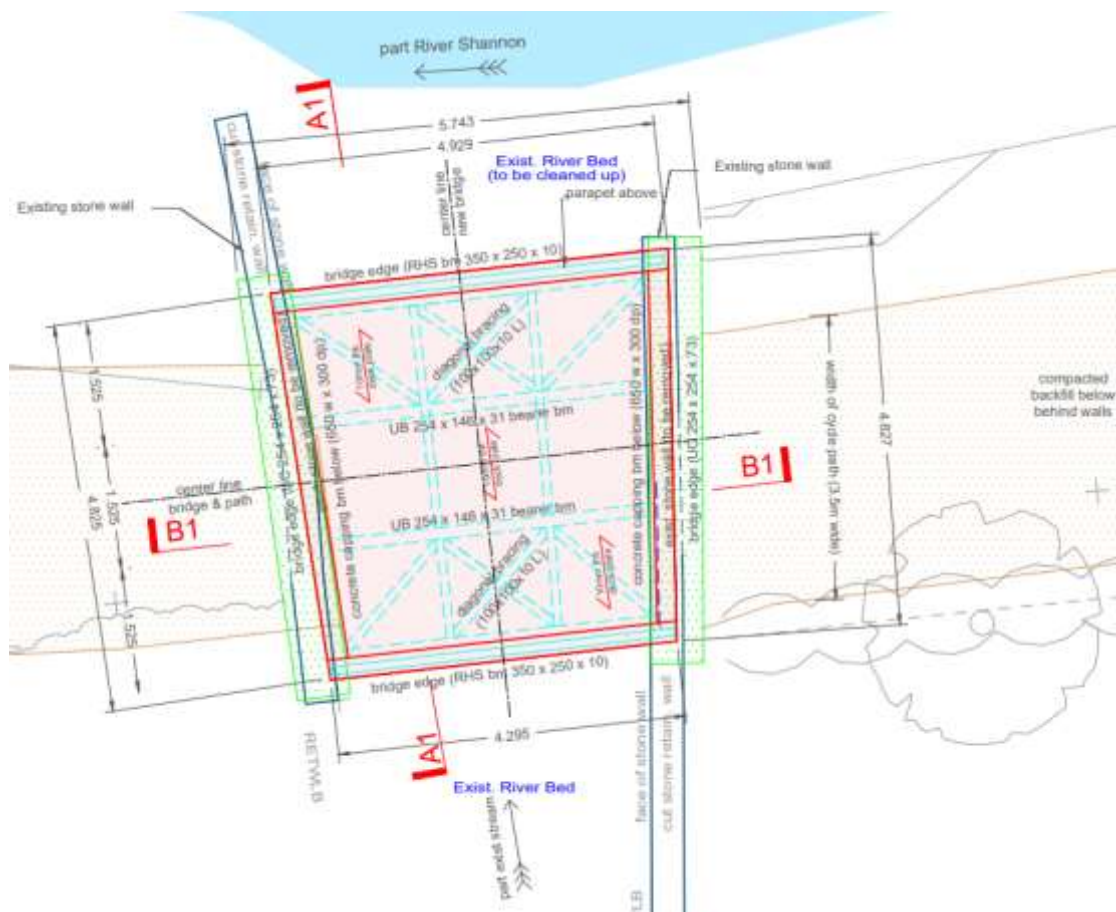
Proposed plan of Bridge 4 deck replacement
